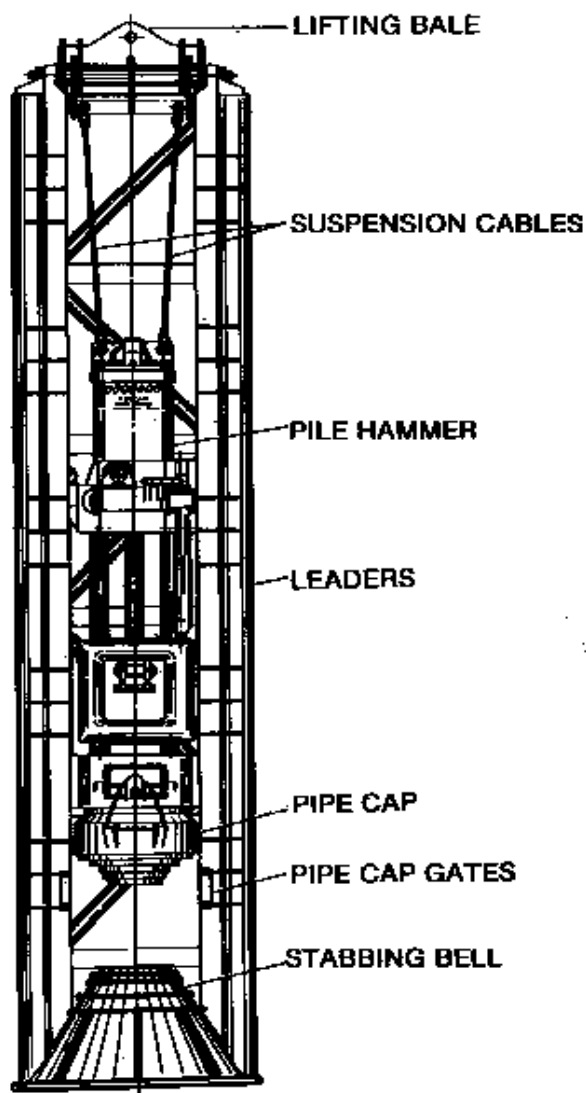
General Arrangement of Vulcan Hammer Assembly
